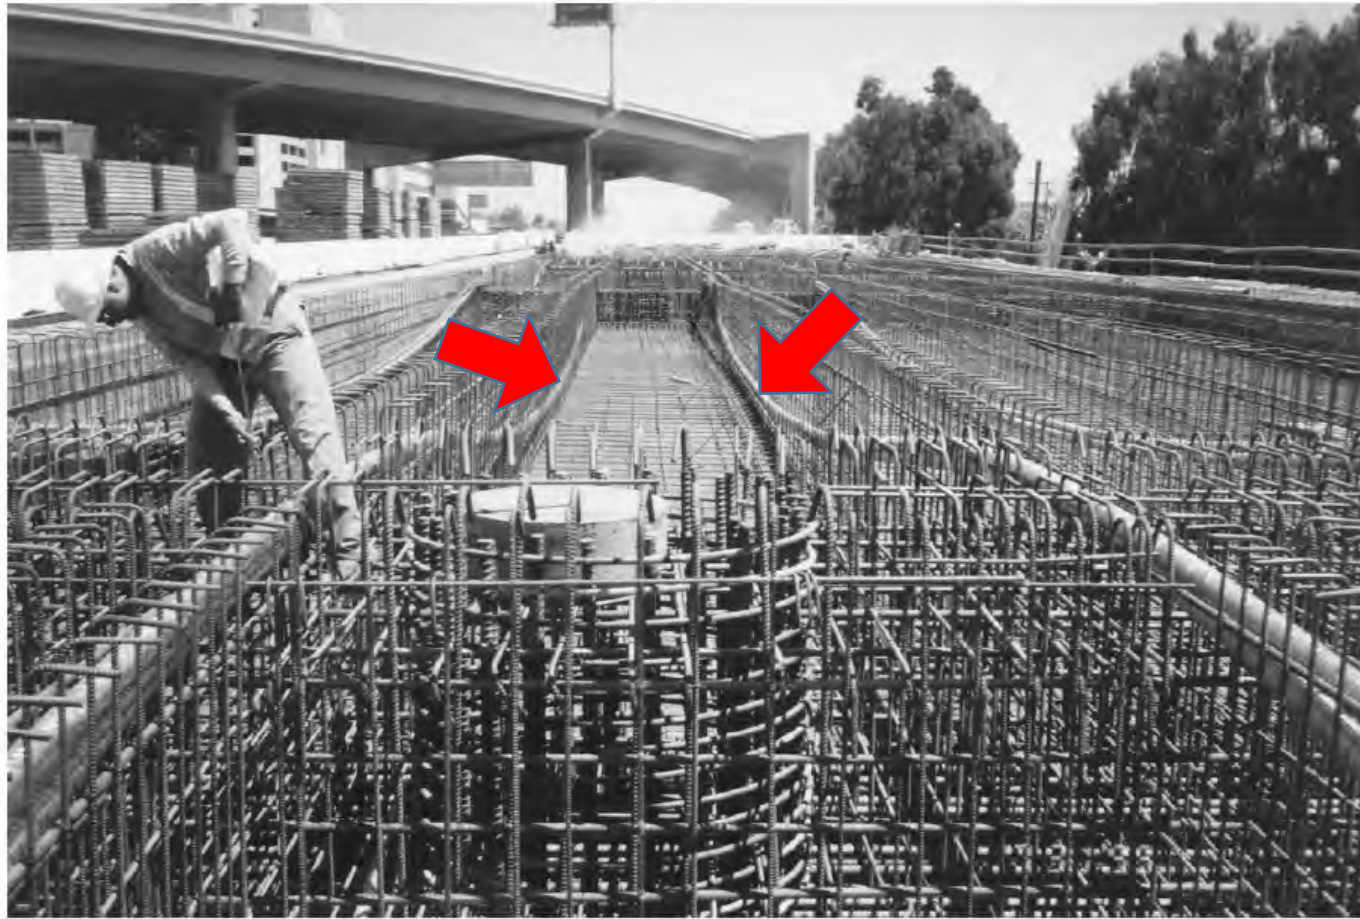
A post-tensioned box-girder bridge under construction.
